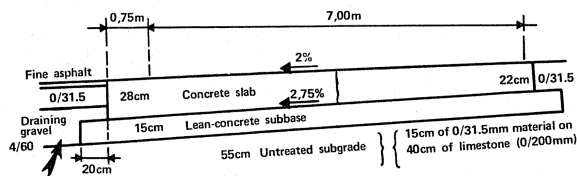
Example of conventional road structure in concrete: slab over lean-concrete subbase. Lateral drainage through pervious gravel.
